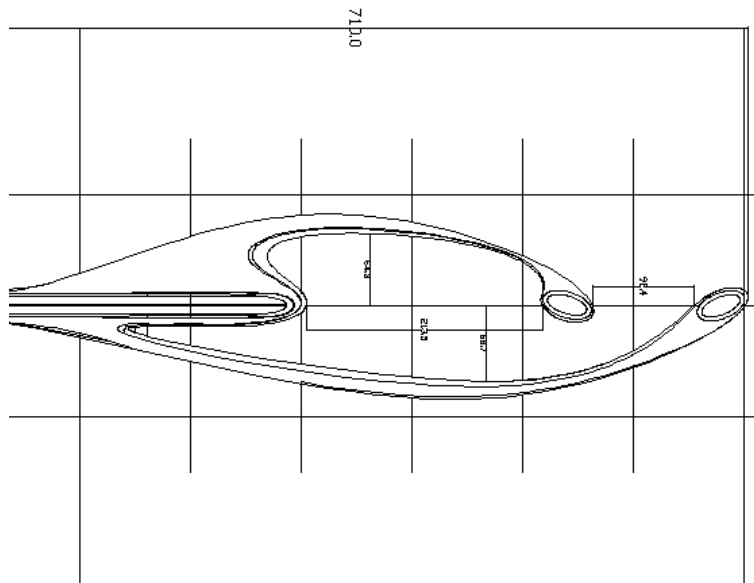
Overview of collision barriers on bridge; provided by Reinertsen AS
